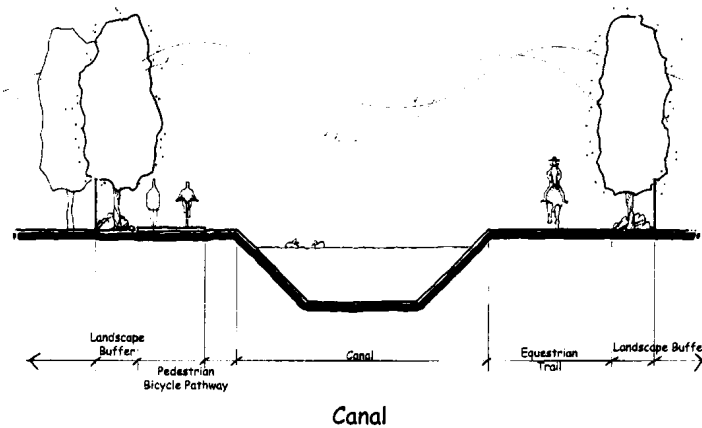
IRRIGATION CANAL TRAIL TYPICAL PROFILE
